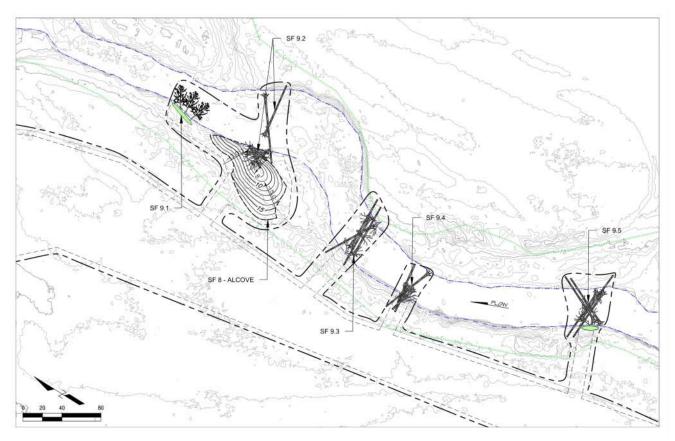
Site plan SF 8 and SF 9 showing grading, large wood structures, and site access. Green ovals show locations for alder removal and tipping into the channel.
